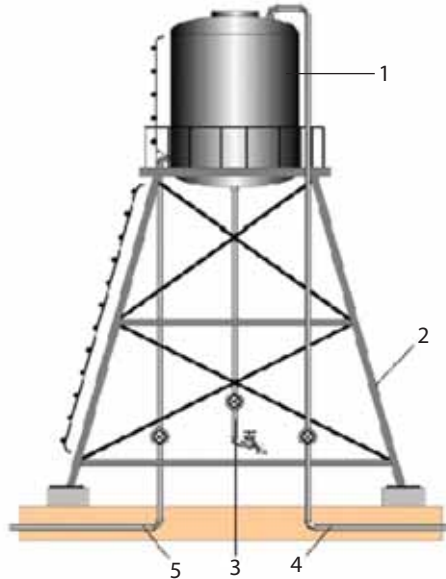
Schematic diagram of a water storage tank (1) with steel tower (2). The drain pipe (3) is connected to the lowest part of the rounded base of the tank. Separate pipes are used to supply water to the tank (4) and the packing facility (5)
